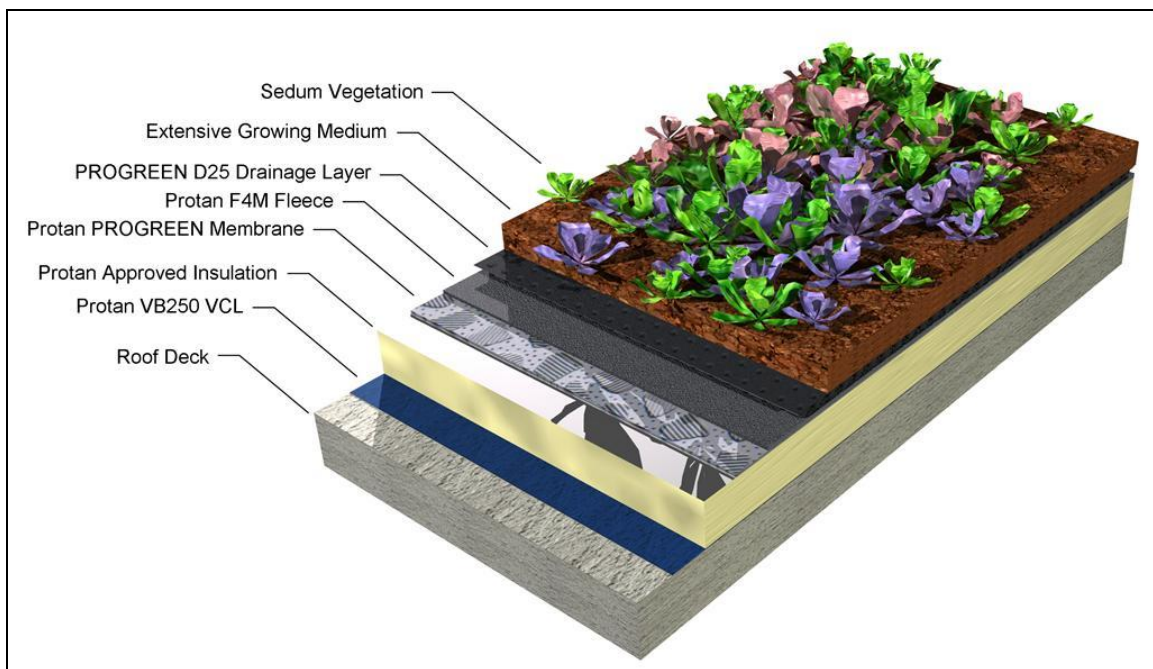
An example of the layers required for a green roofing system (Protan, 2008)
